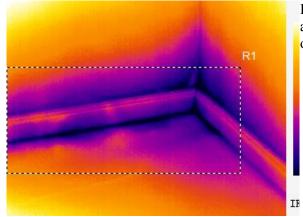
Thermal image of the basement floor at the junction of the exterior walls of the 1st floor of the building.
